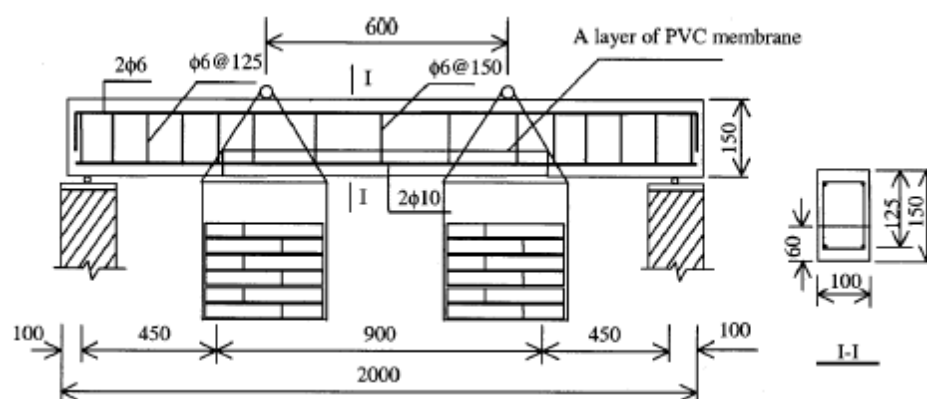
Details of Long-term Test Specimens (Xiong, Liu and Xie 2000).
